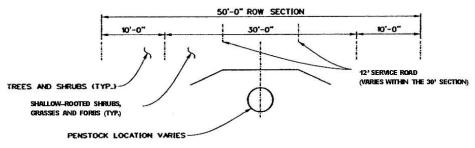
C. Typical cross section of penstock ROW with service road, per FERCapproved construction drawing YCH-1116.
